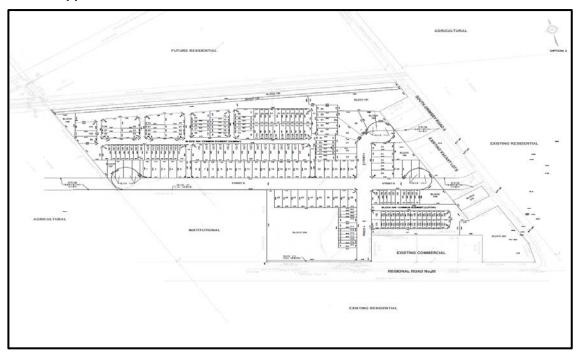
Preliminary Draft Plan of Subdivision, prepared by IBI Group
